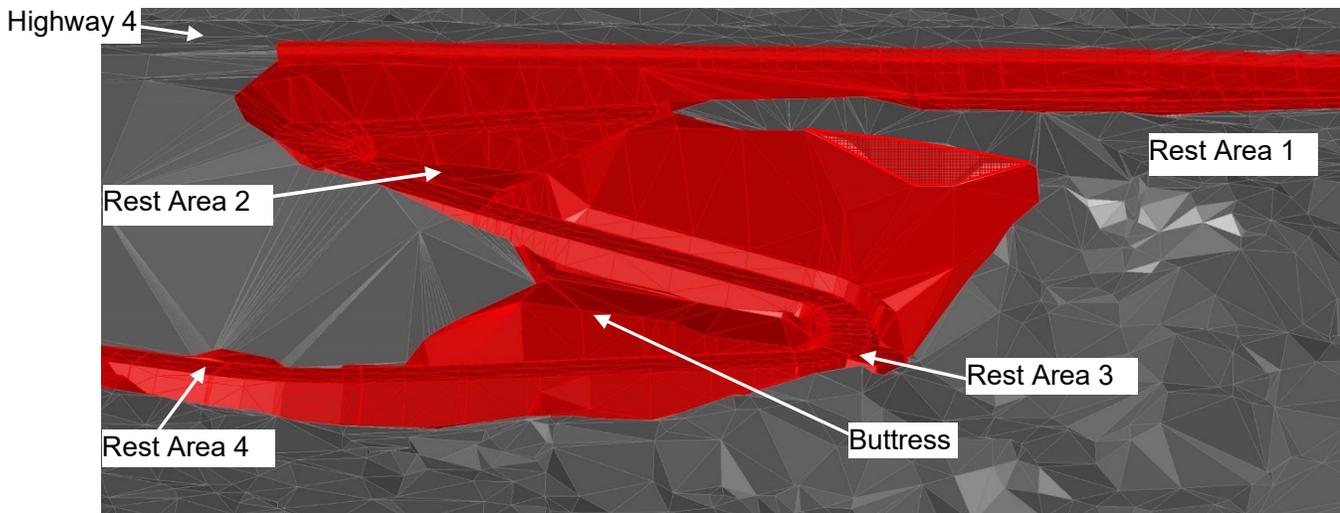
B 3D Rendering of proposed trail looking north (from low to high)
